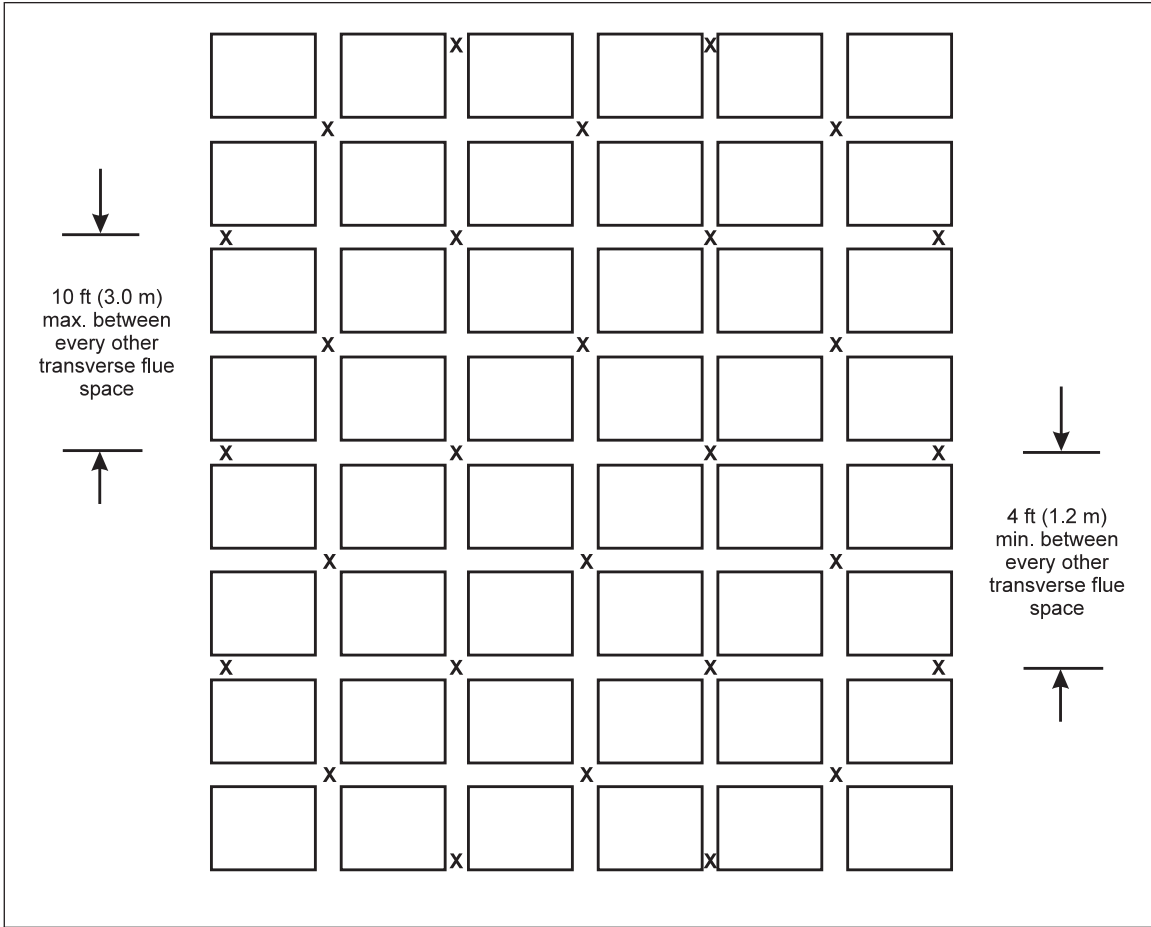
Plan view of IRAS(EO) in-rack sprinkler arrangement for multiple-row racks
